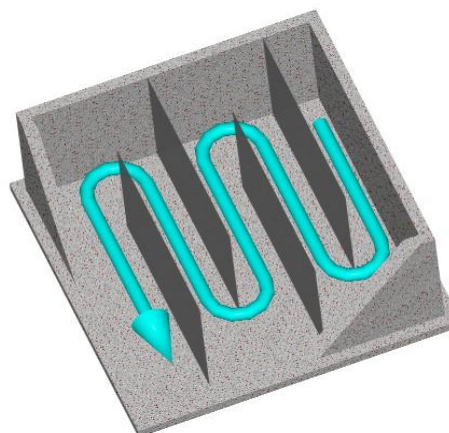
A section view of the proposed baffling that could be added to the existing basins.
